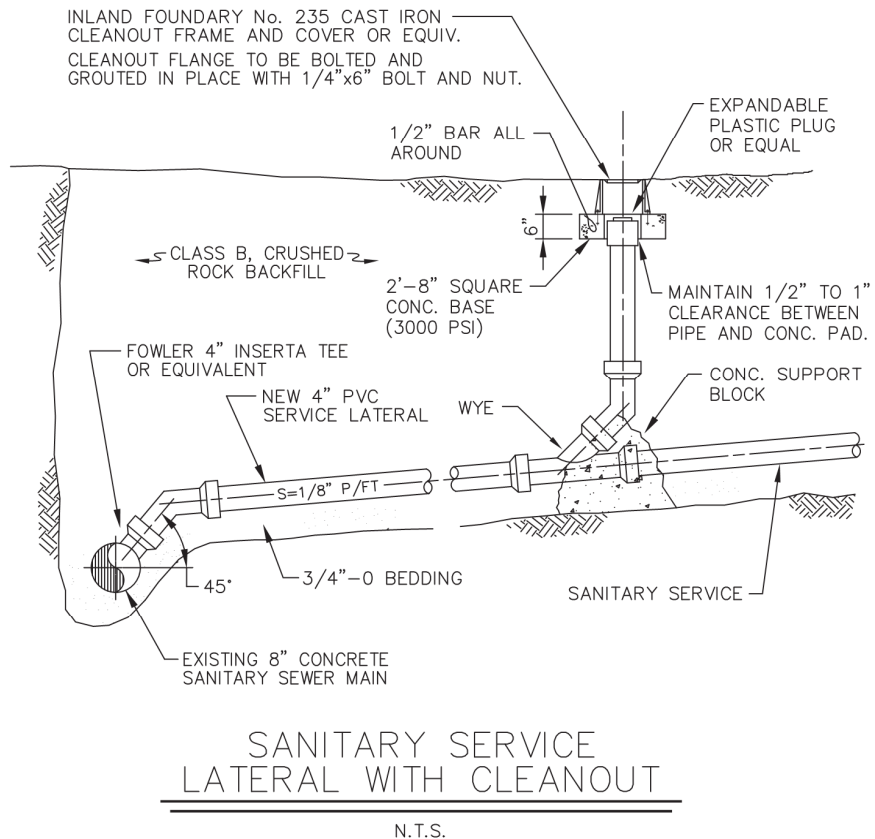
A section view detailing a sanitary sewer cleanout with lateral connection to the main sewer.
